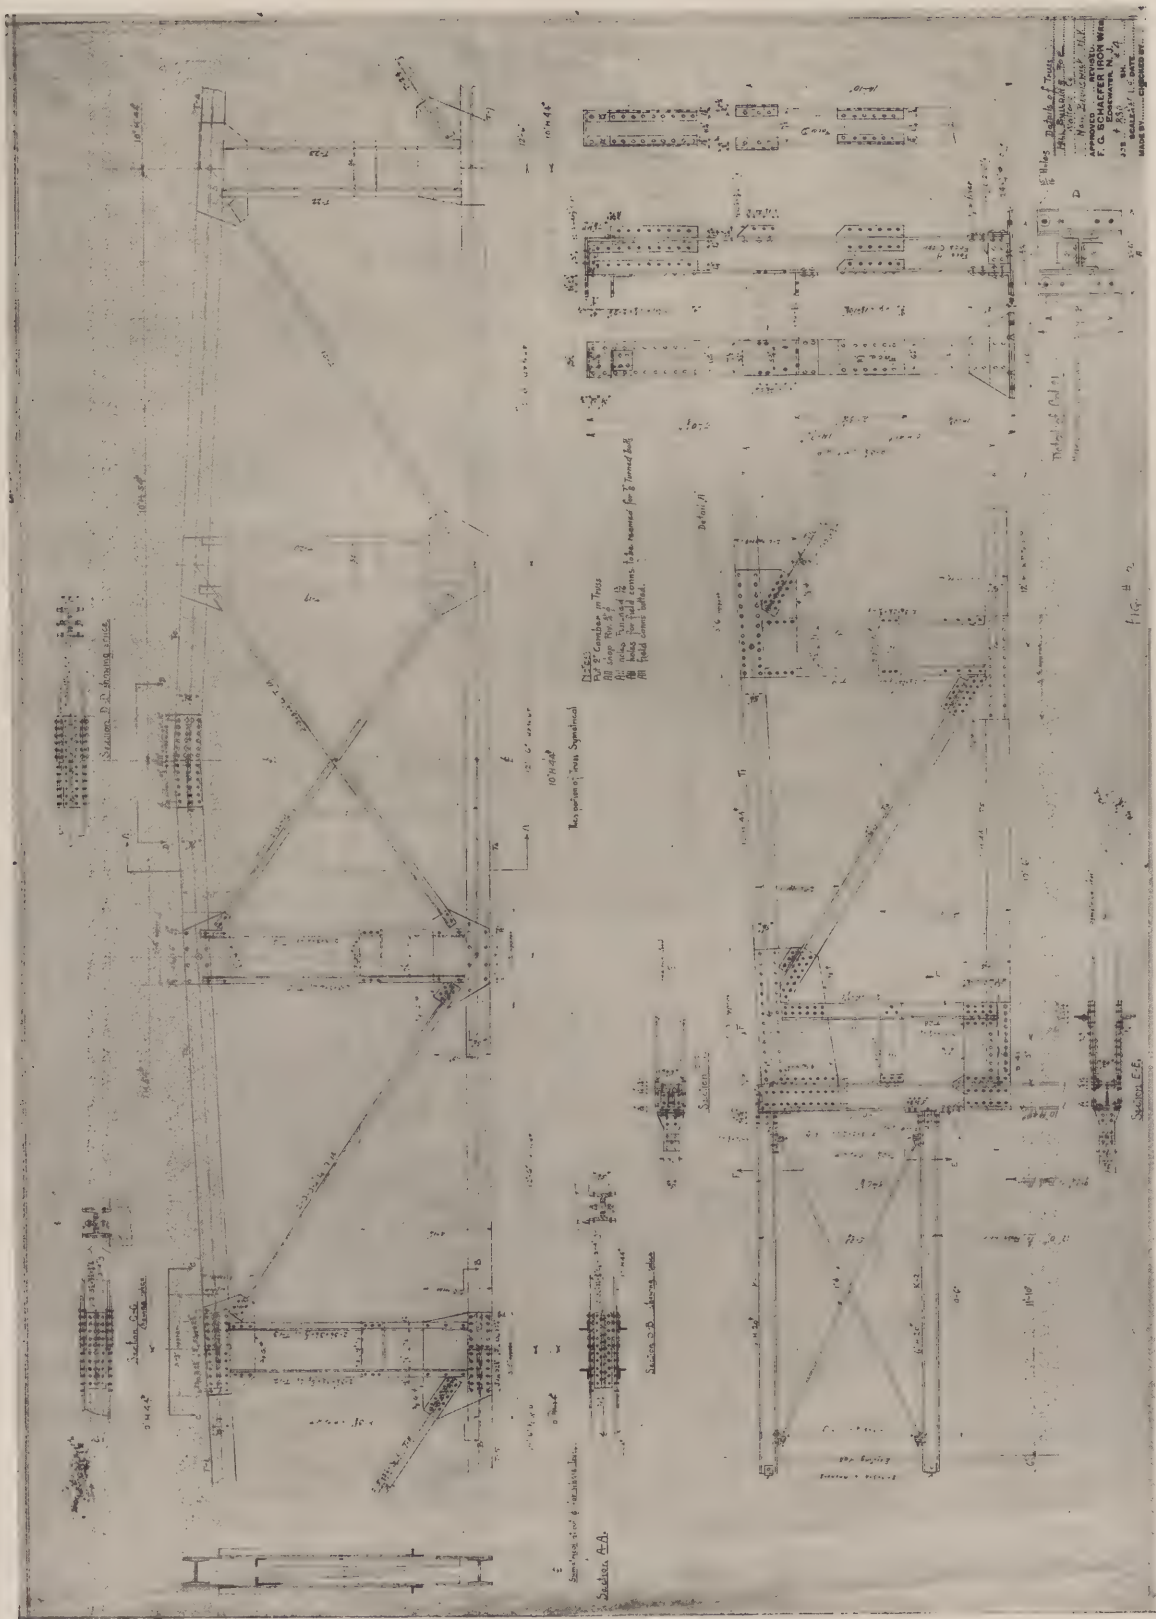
Details of Truss. Mill Building for Walton Co., New Brunswick, N. Y.
